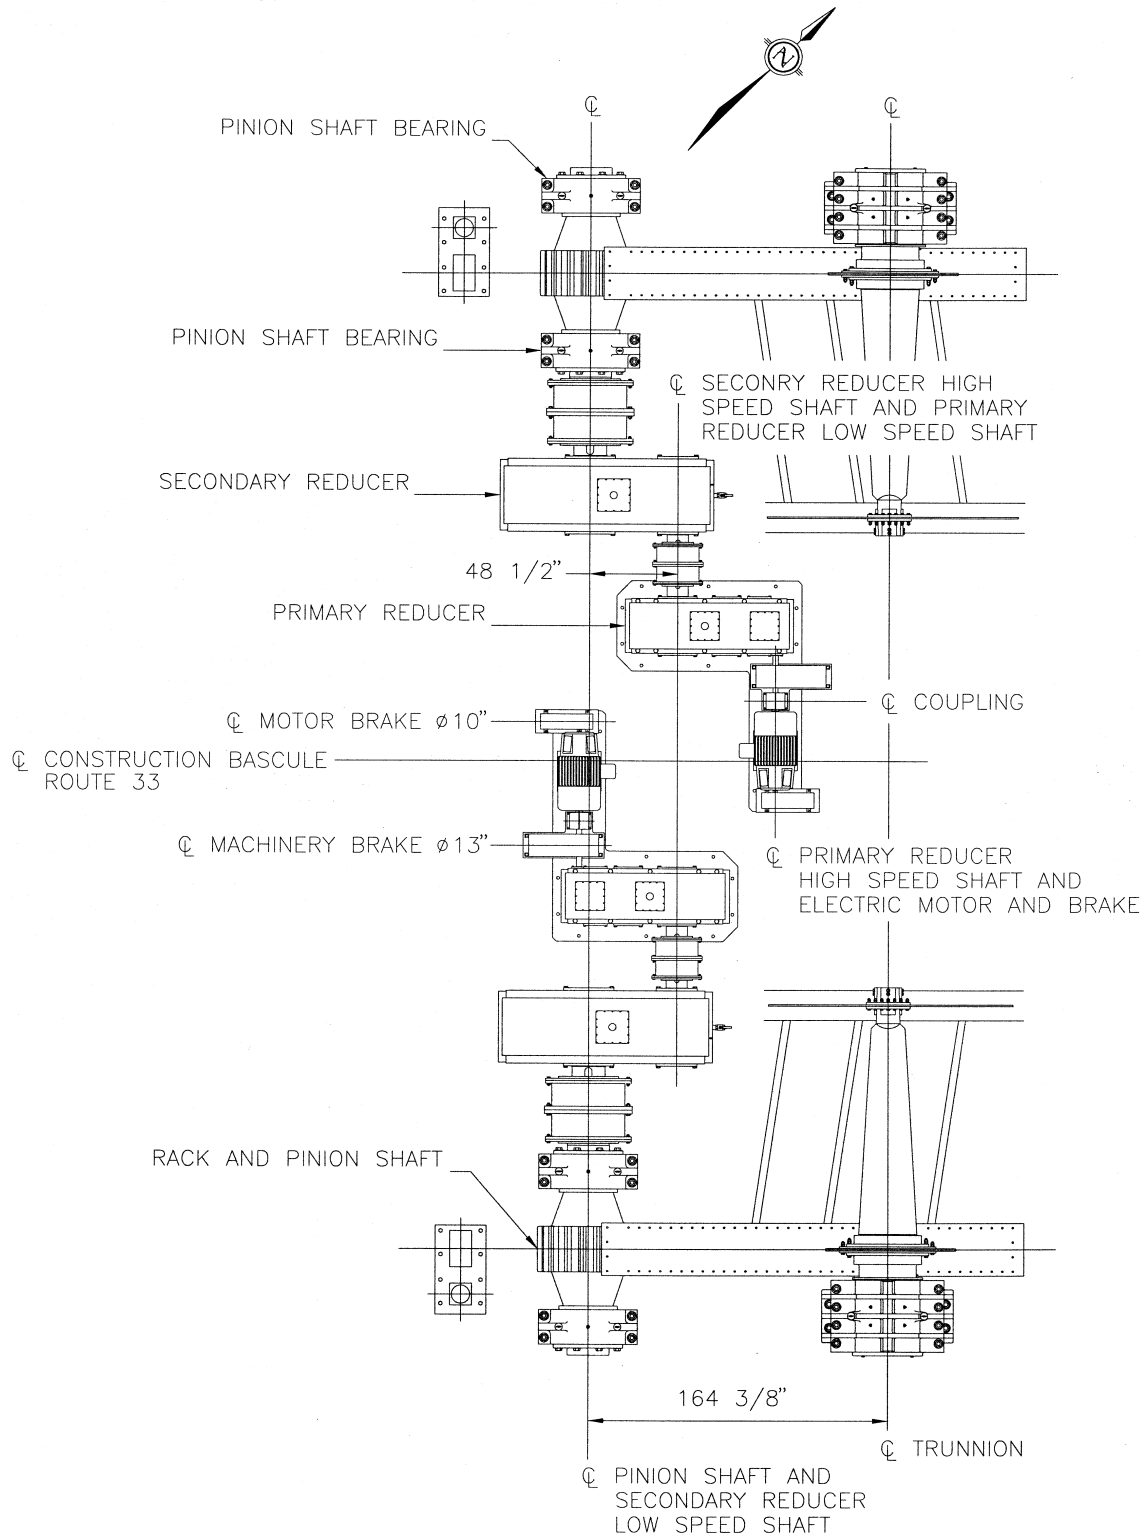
Machinery Layout: Dual Independent Drive Systems
